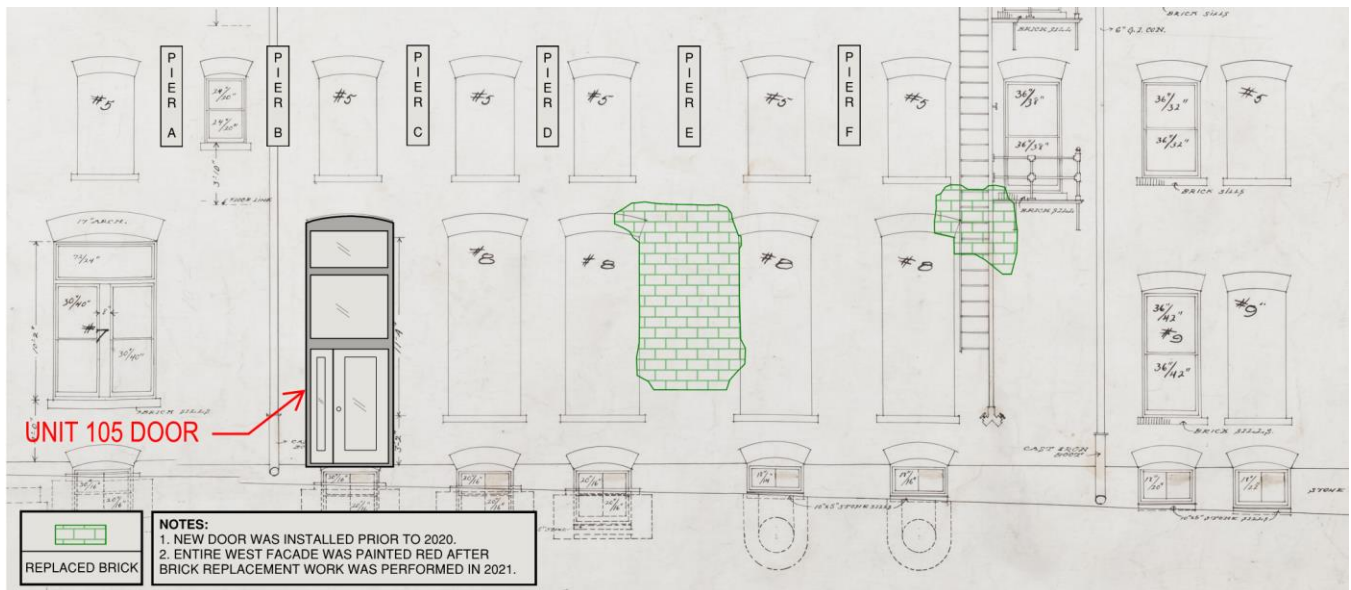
West elevation markup indicating areas of repair completed in 2021.
